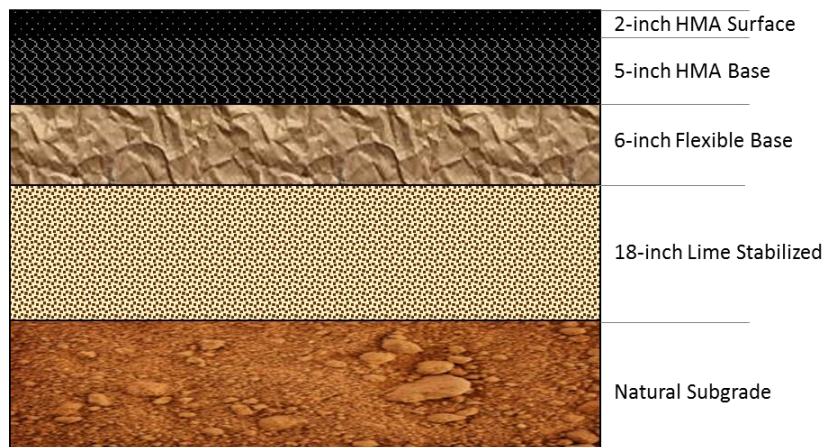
Base Case Flexible Pavement Design Structure.⁵⁶
